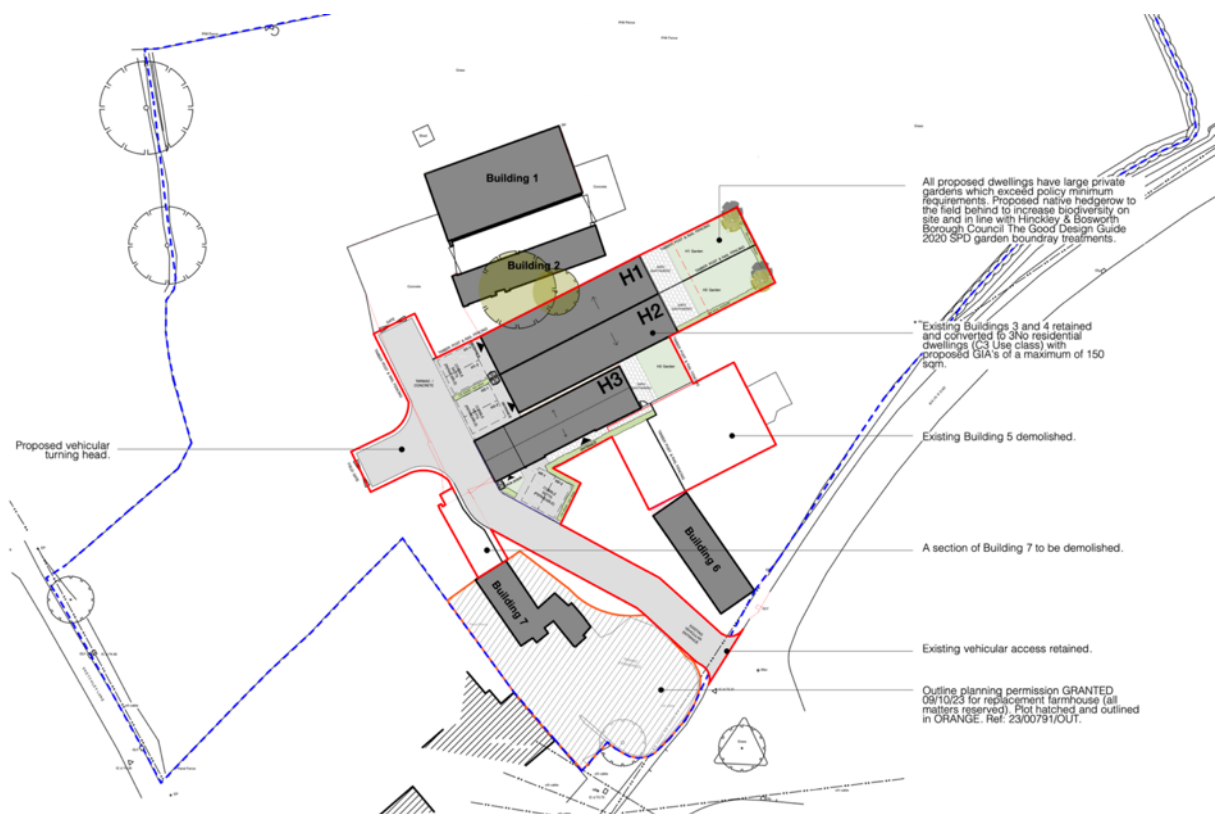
Approved Class Q Proposed Site Plan. Not to scale.
